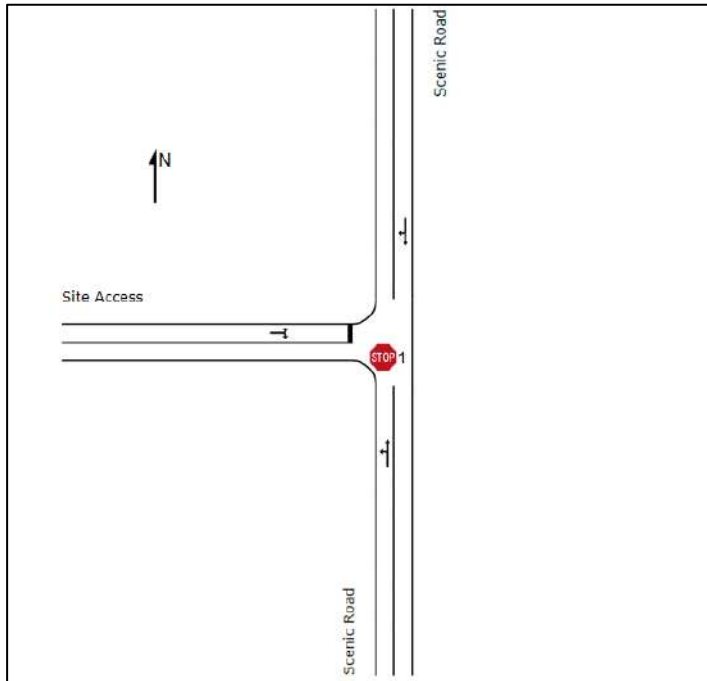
SIDRA Model – Scenic Road & Proposed Site Access
